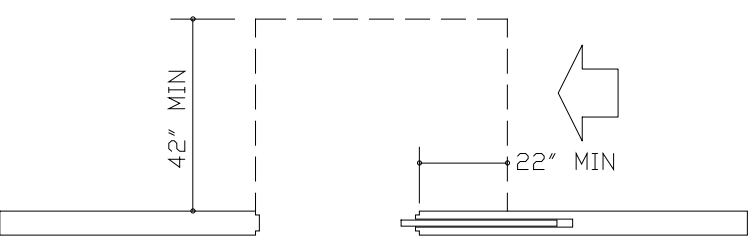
HINGE SIDE APPROACH-SLIDING/FOLDING DOORS
